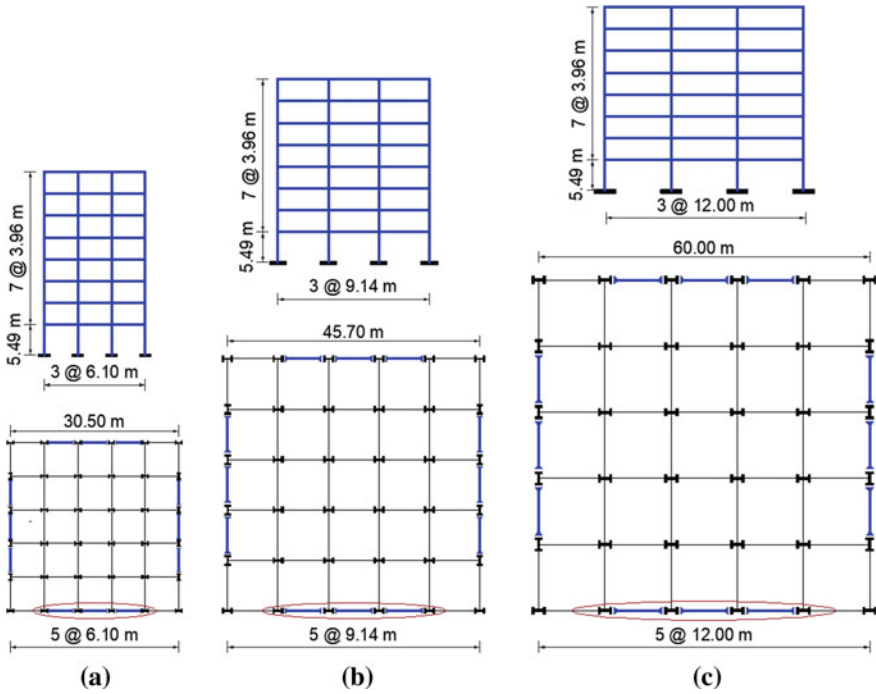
Plan and elevation views of building models: a 6.10 span, b 9.14 span and c 12.00 m span
